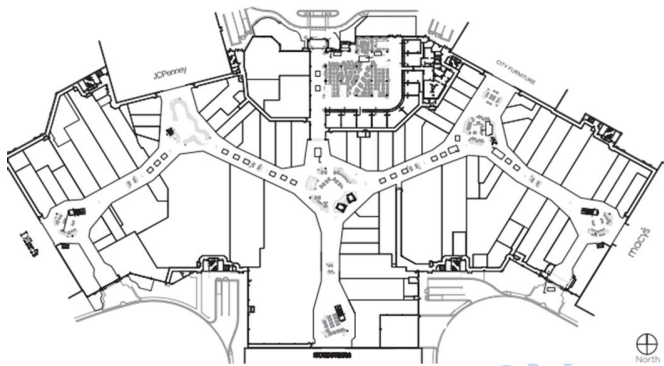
Mall layout of the mall at Wellington Green, South Florida, USA
